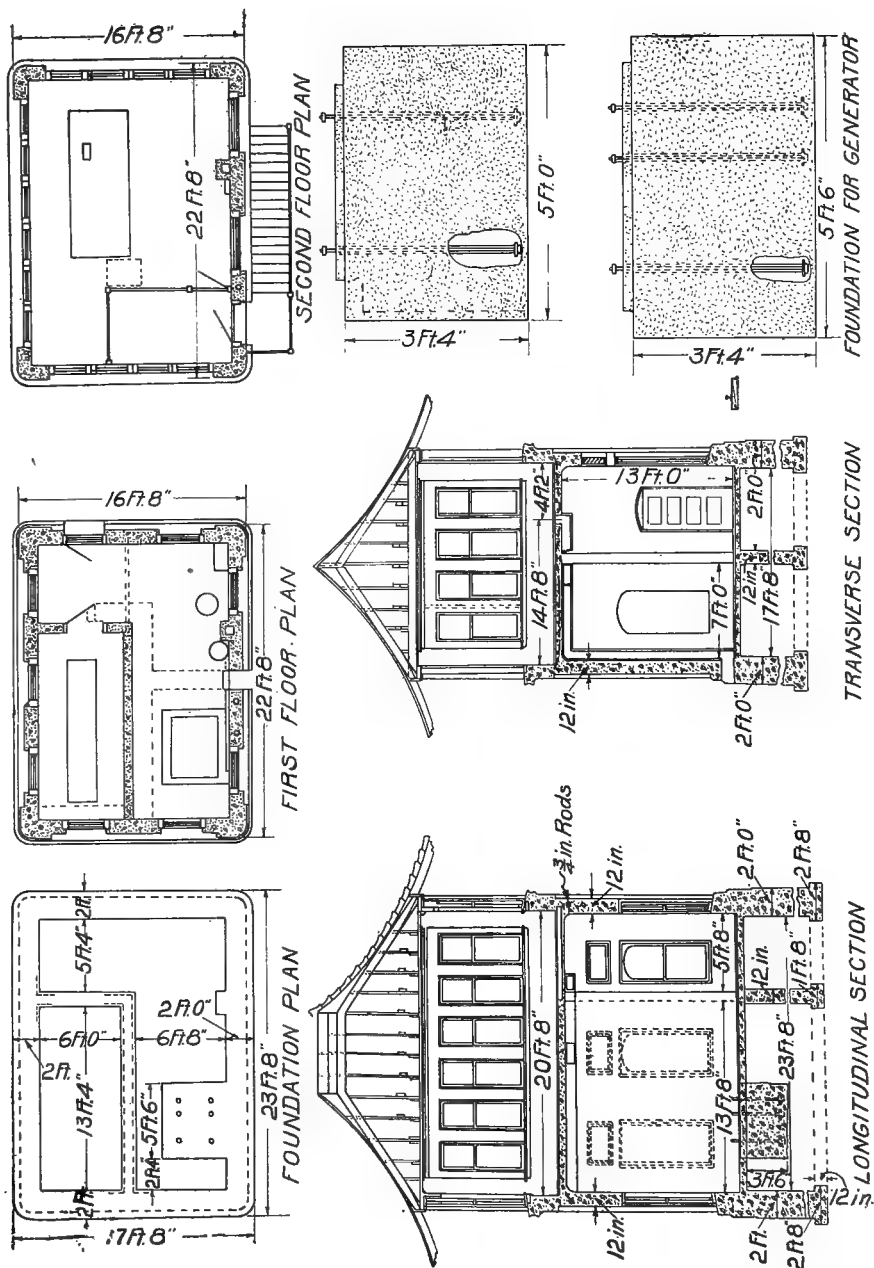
DETAILS OF CONSTRUCTION, NAUGATUCK SIGNAL TOWER, N. Y., N. H. & H. R. R.
